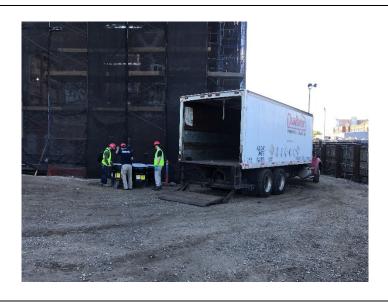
Facing northeast, Aquifer Drilling and Testing prepares to install the two temporary piezometers directly east of the turbine hall.
